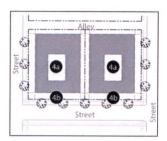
Figure BT-B. Determining Permitted Building Size (Ground Floor Footprint) and Volume
